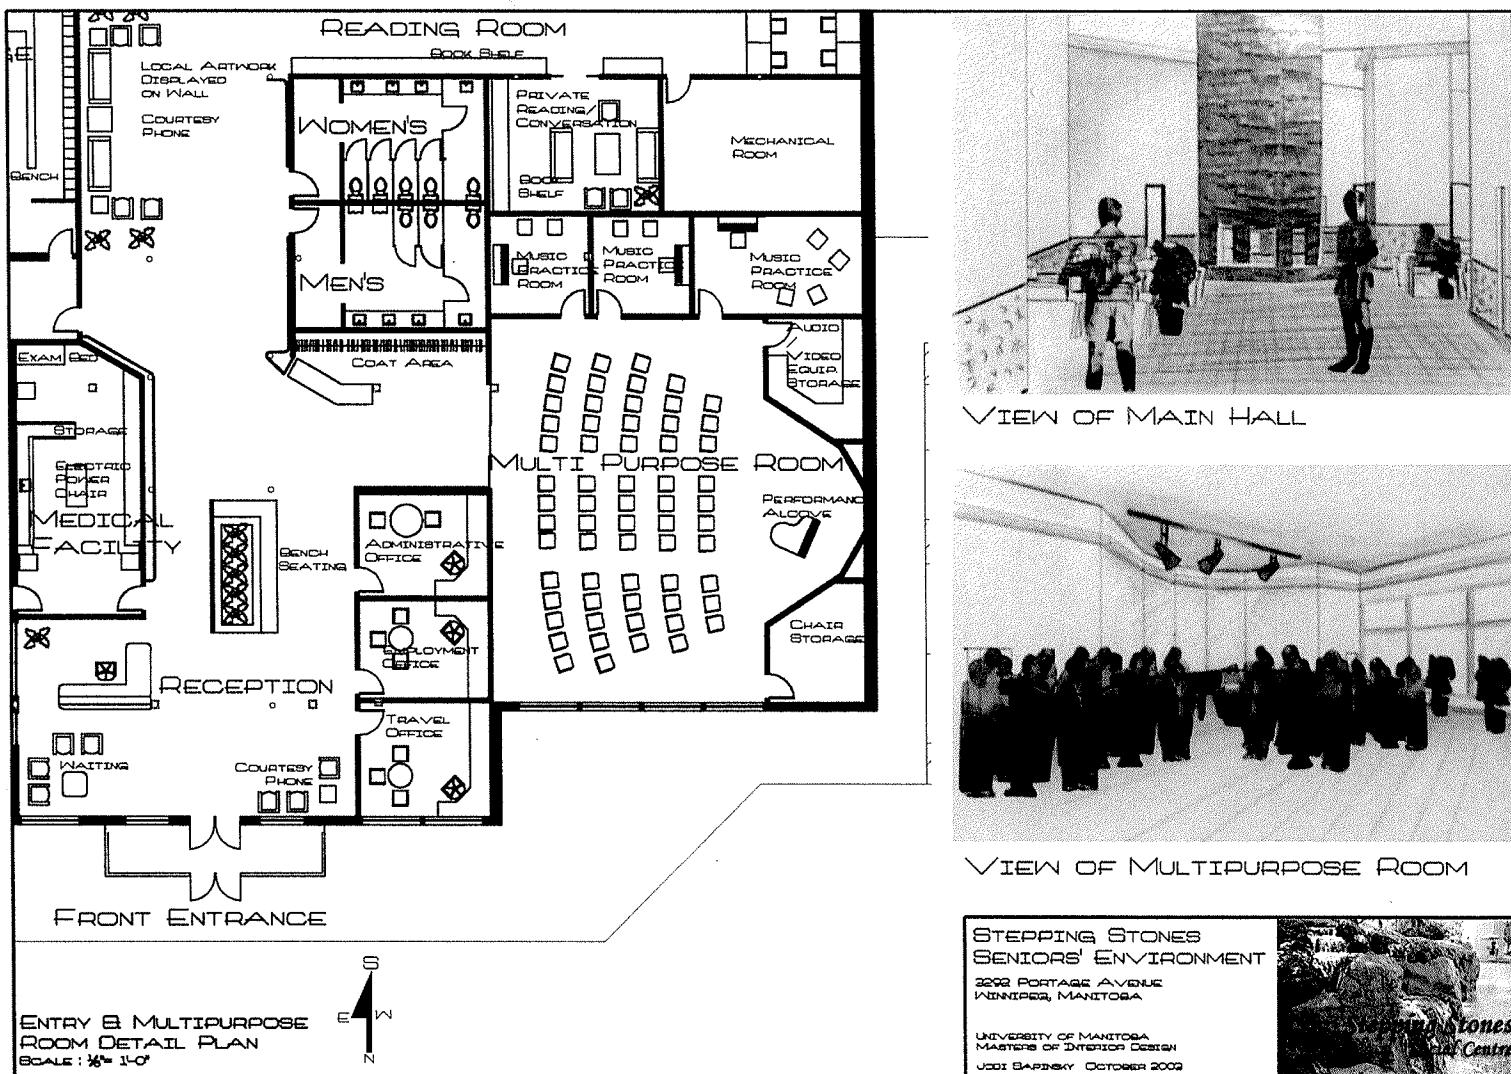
Entry & Multipurpose Room Detail Plan *Jodi Sapinsky
